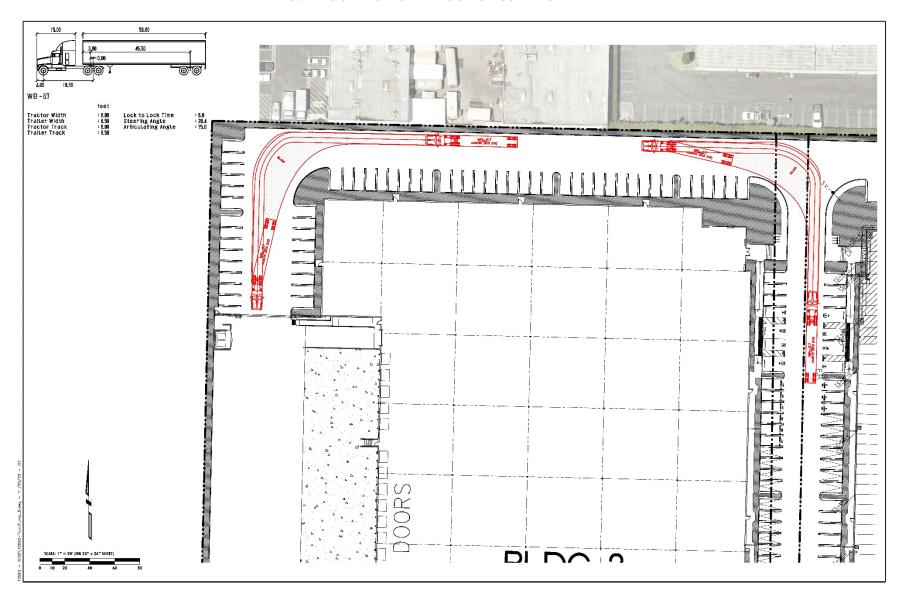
OUTBOUND TRUCK ACCESS AT DRIVEWAY 2
